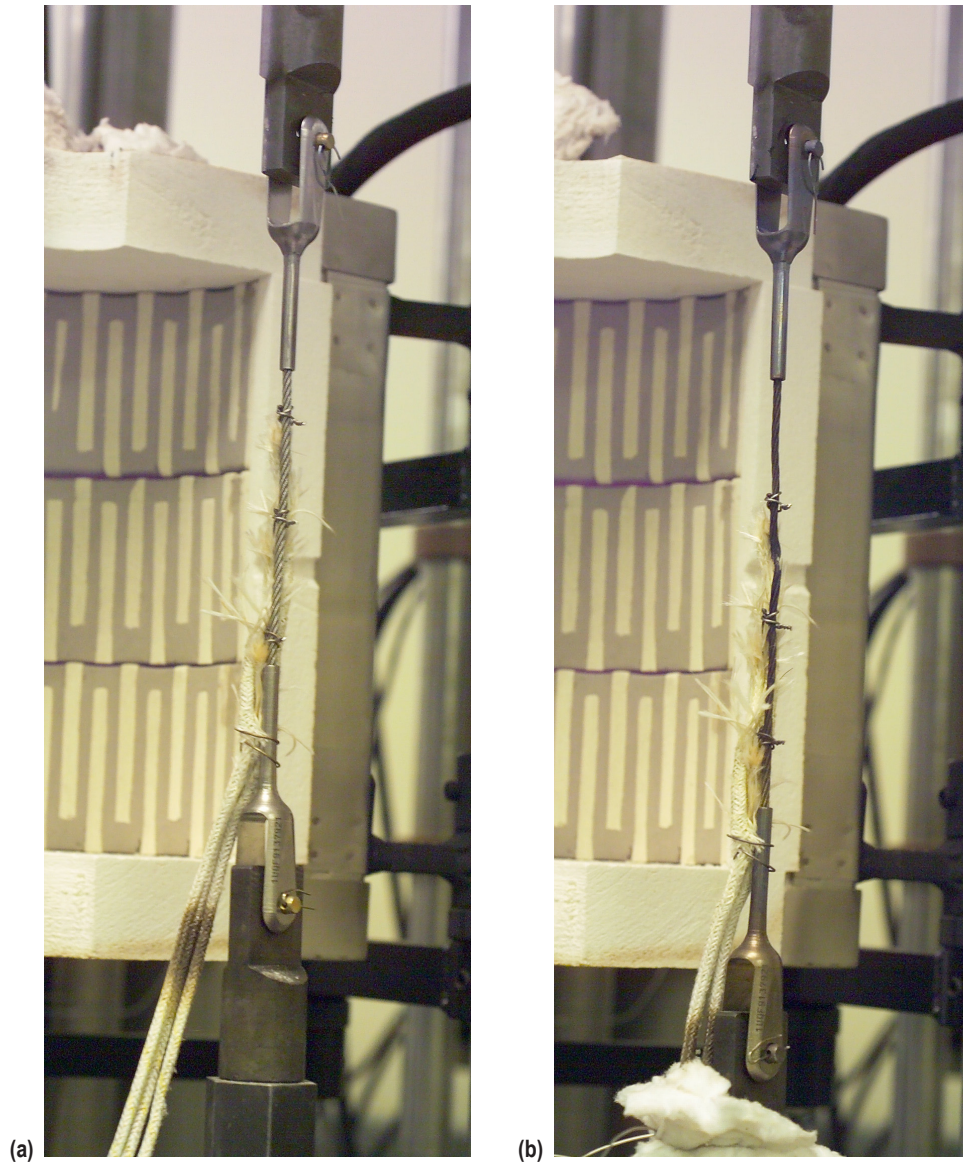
071081-ELV-7 (a) before testing and (b) after testing.
